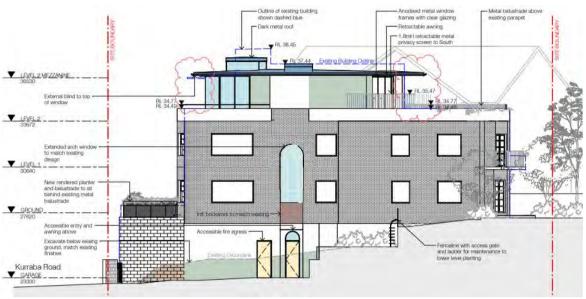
Proposed South Elevation, DA-1401 Rev 19
